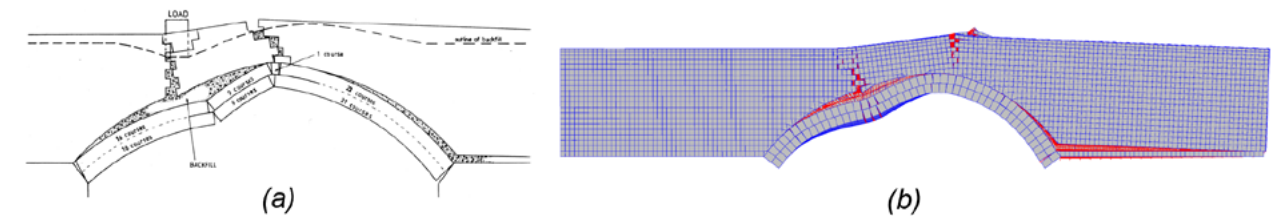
(a) Experimental failure mode; (b) Numerical deformed shape at failure for square bridge "Bridge 3-3" (Melbourne and Gilbert, 1995).
